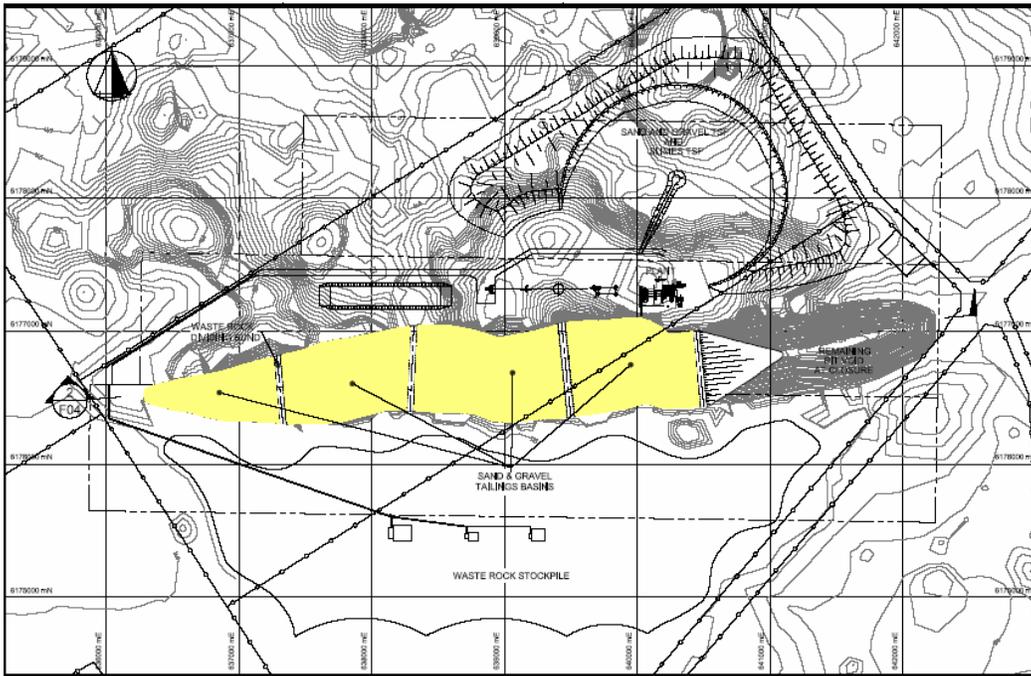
Conceptual site layout plan of surface and in-pit tailings storage facilities
